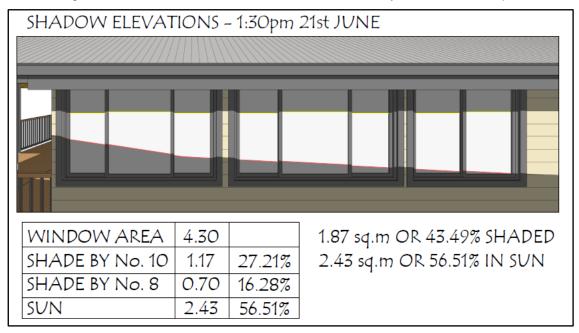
Revised shadow elevations for 10 Admiralty Crescent at 1:30 pm
